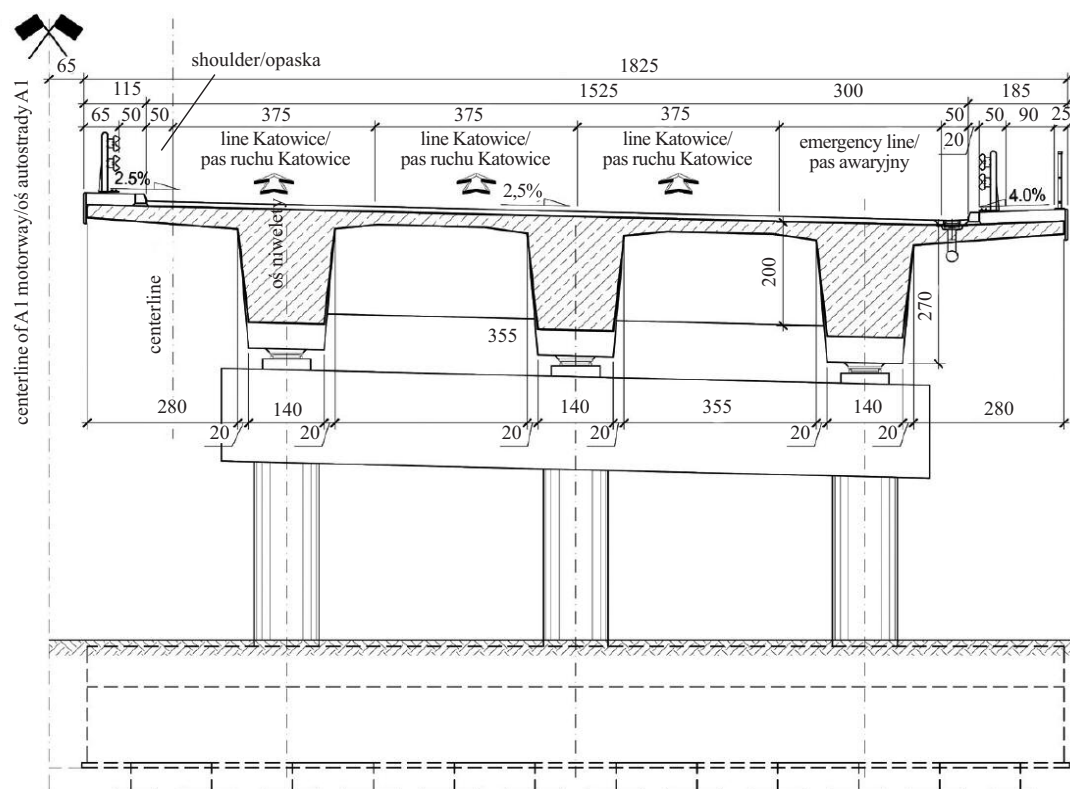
Cross-section of the replacement design span with a view of the intermediate support (P2) [5]
